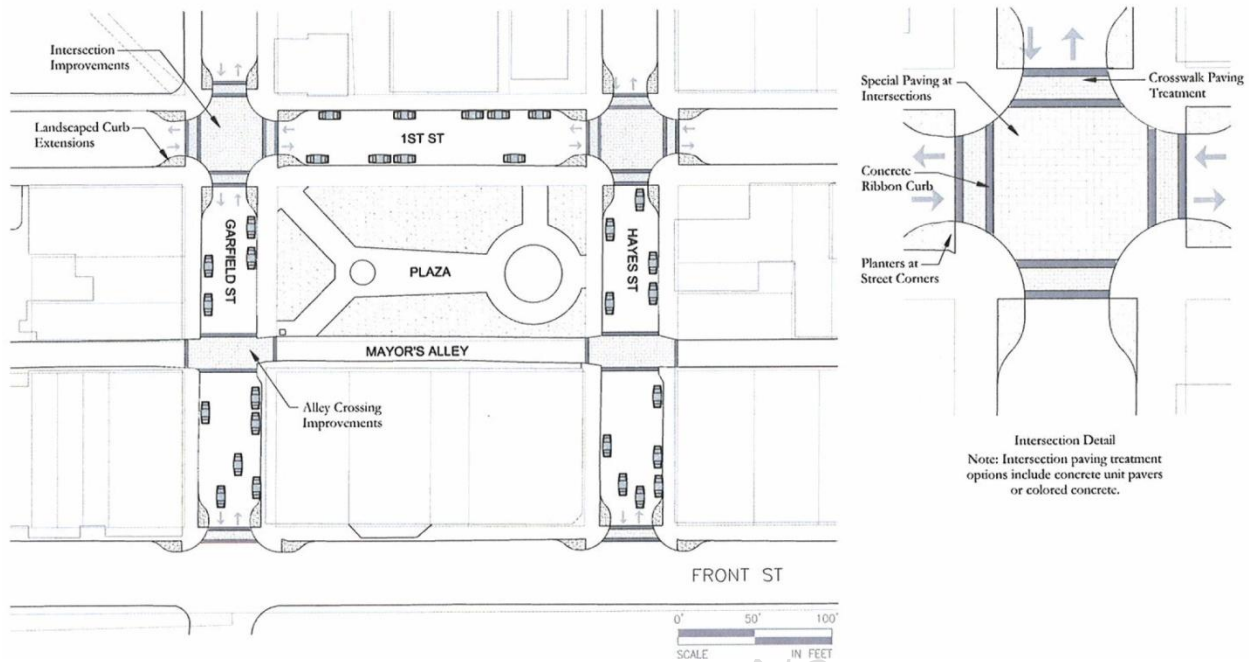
M (Plaza Street Plan – Two-Way Traffic Concept)
